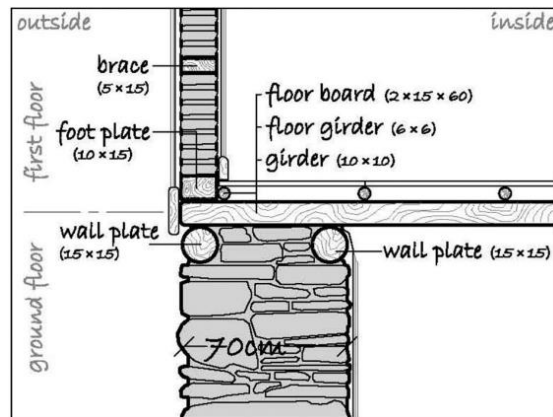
Schematic drawing of the detailing between masonry ground floor and timber-frame upper floor on an case study structure from Birgi, Turkey [3]
